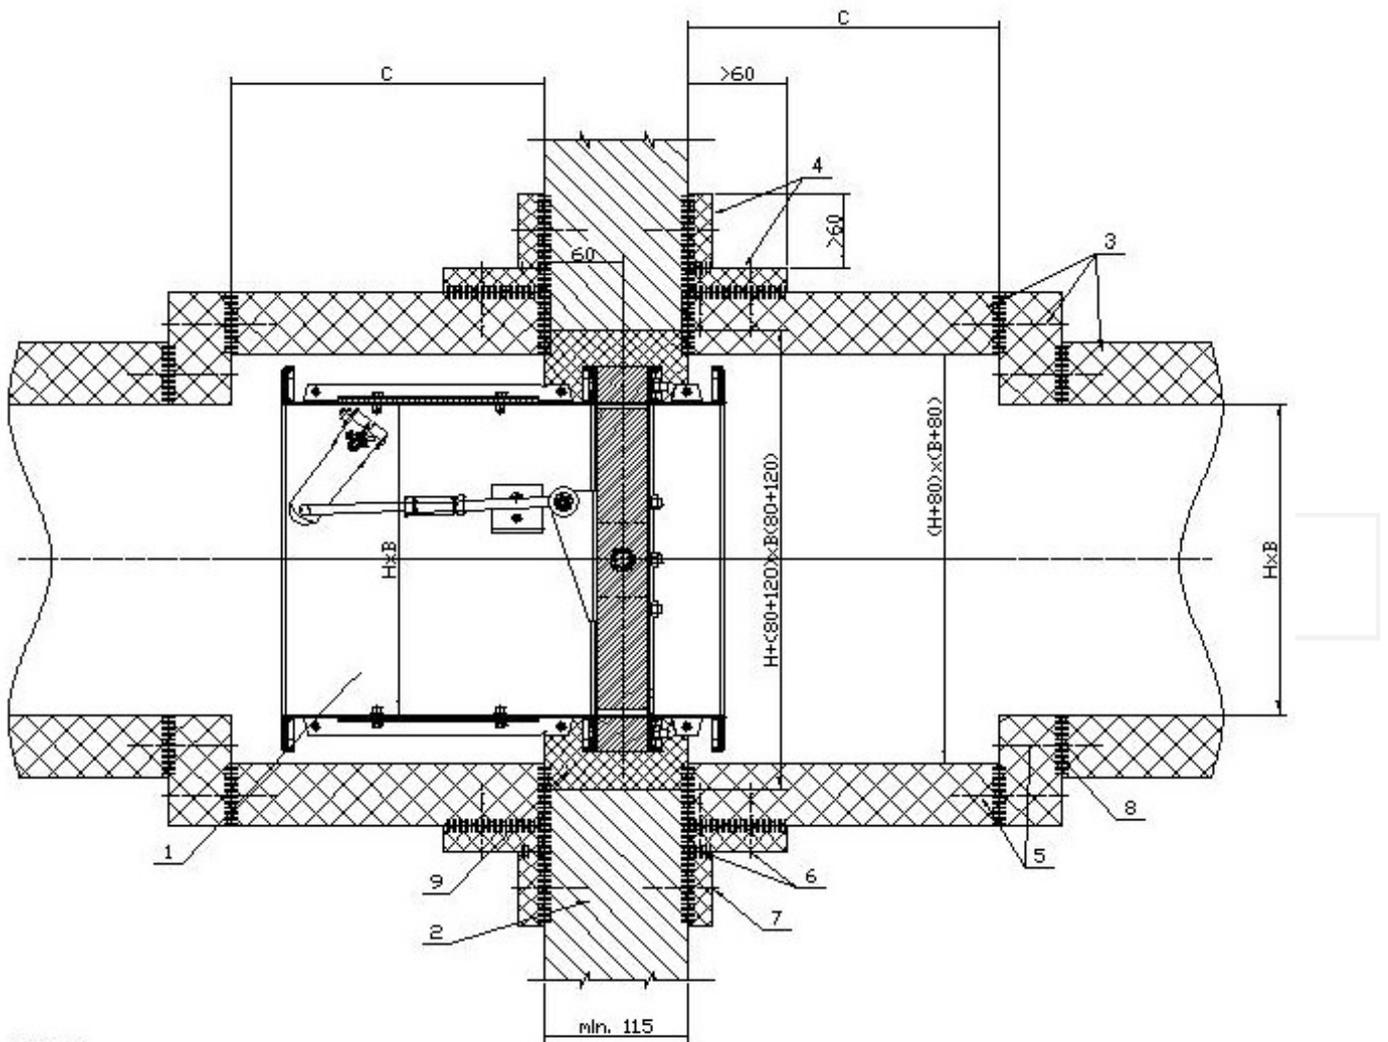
Installation method of fire dampers KWP-O in rigid wall
